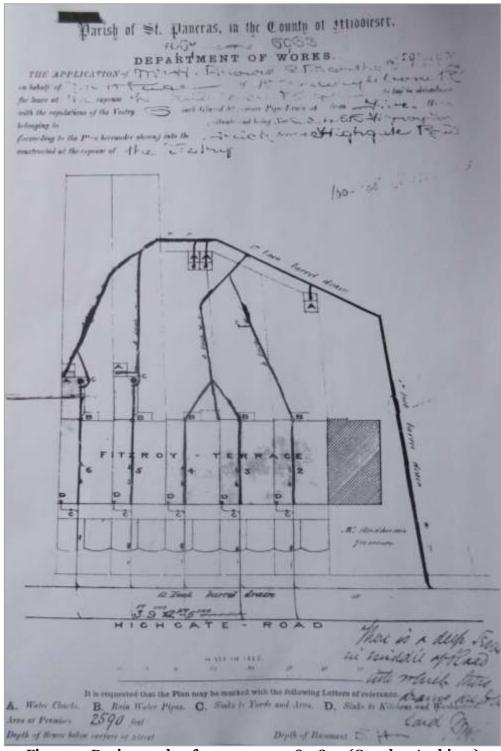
Drainage plan for nos. 100-108, 1890 (Camden Archives)
